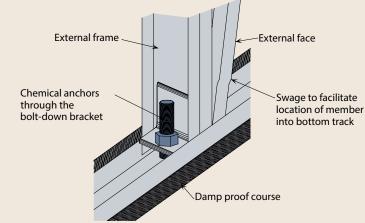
Different forms of anchorage of light steel frames to foundations
